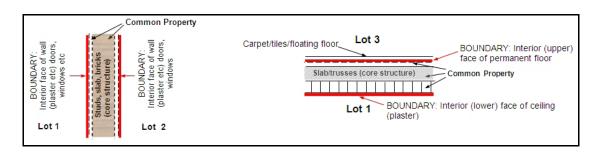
Interior face of internal walls (Left) and internal floors/ceiling (Right) (LandVictoria, 2012a)
